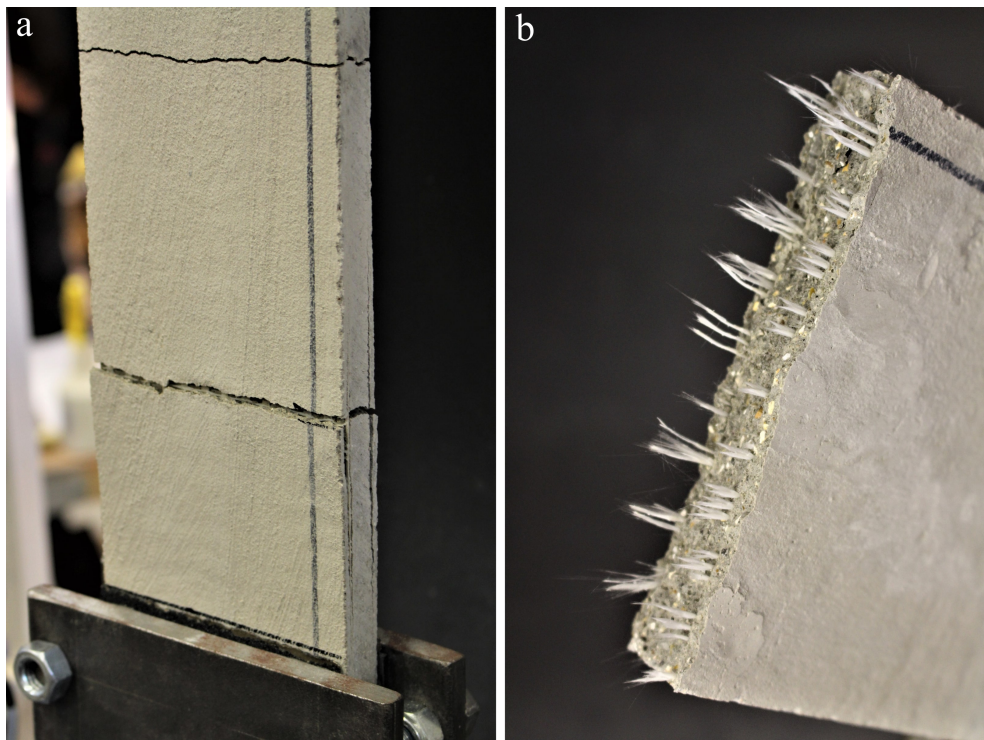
Tensile testing of TRC specimens, showing a) cracking and delamination of cover layers and b) fibre rupture and pull-out (fill direction).
